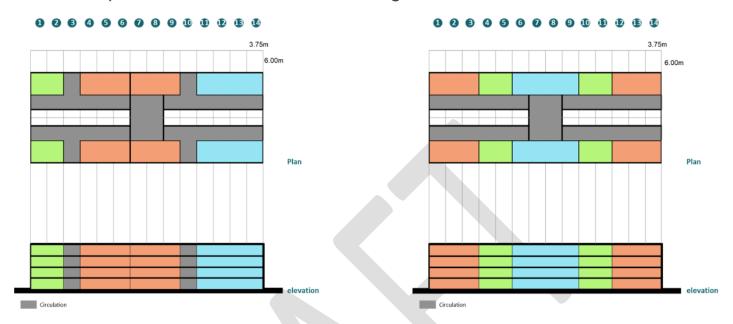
Linear Apartment with Ground Floor Retail Unit
